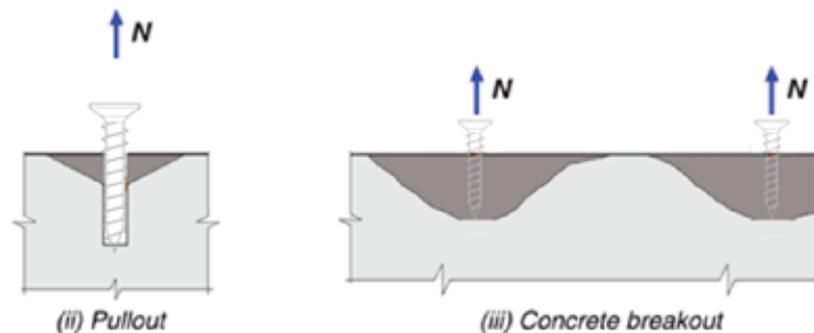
Pull Out and Break Out Failure Modes (ACI 318-19)
